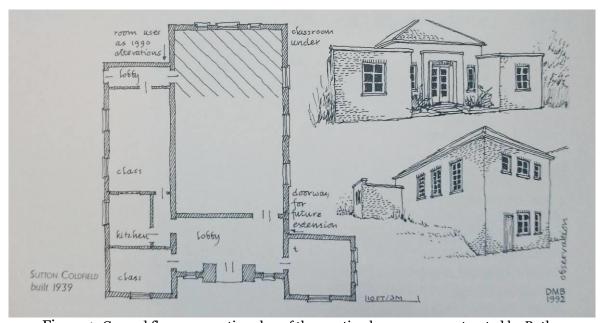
Ground floor perspective plan of the meeting house as reconstructed by Butler (north to the bottom left corner; not to scale) (Butler (1999), vol. 2, p.646)
